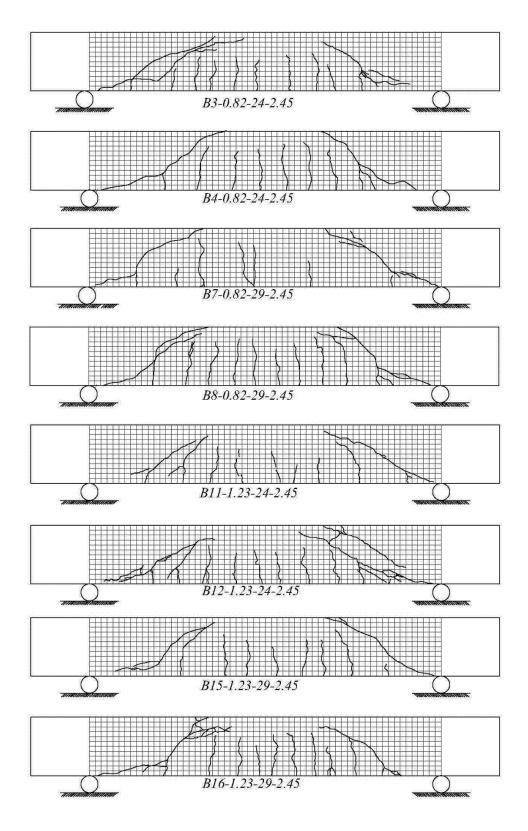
Failure Patterns of Brick Aggregate (BA) Beams
